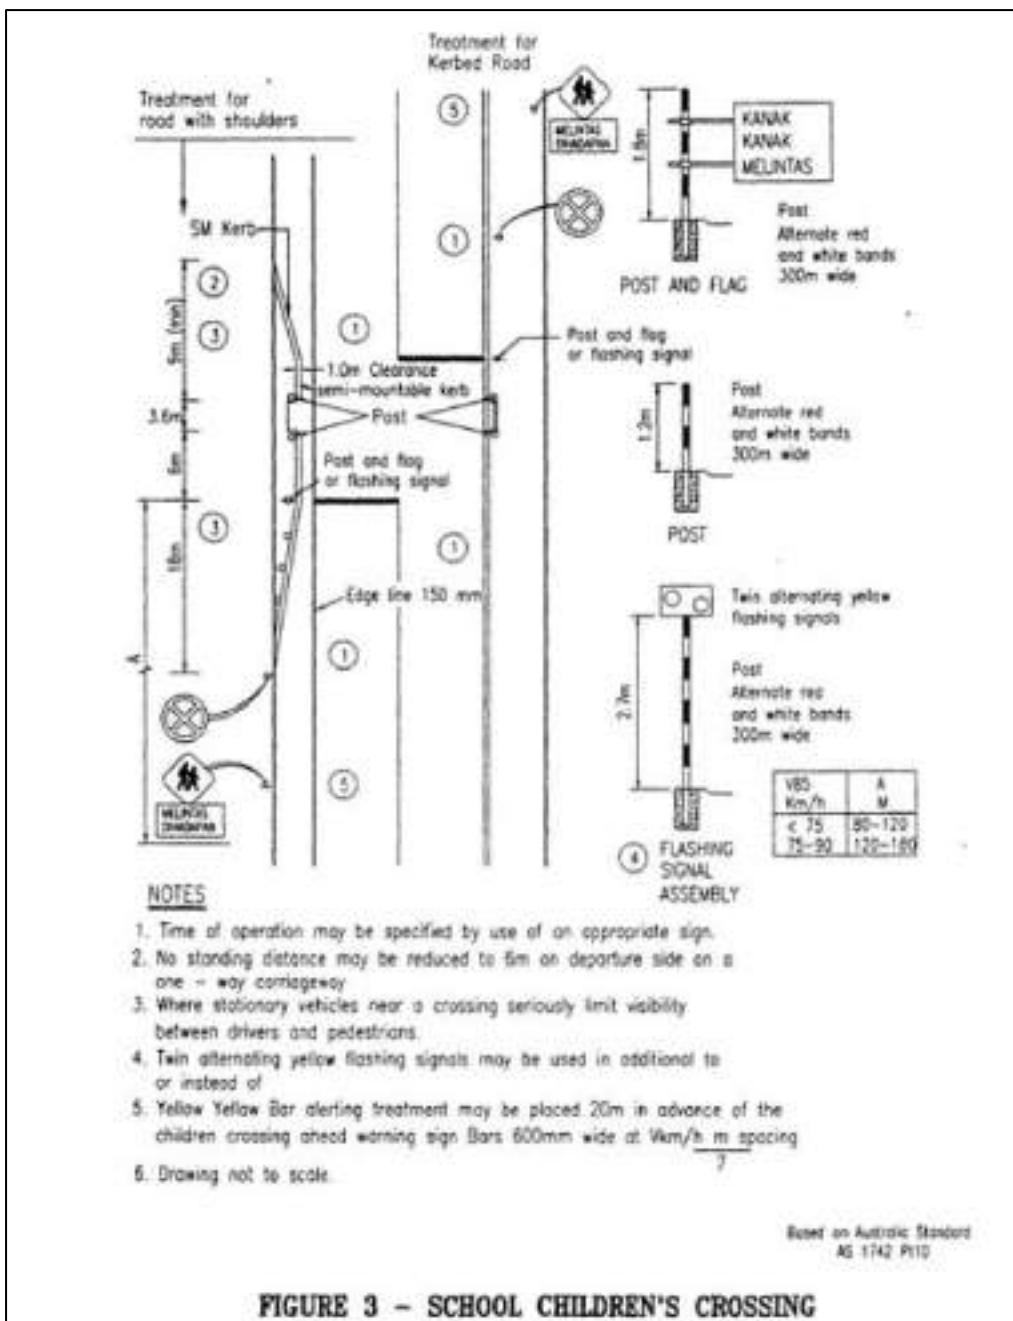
SCHOOL CHILDREN'S CROSSING
